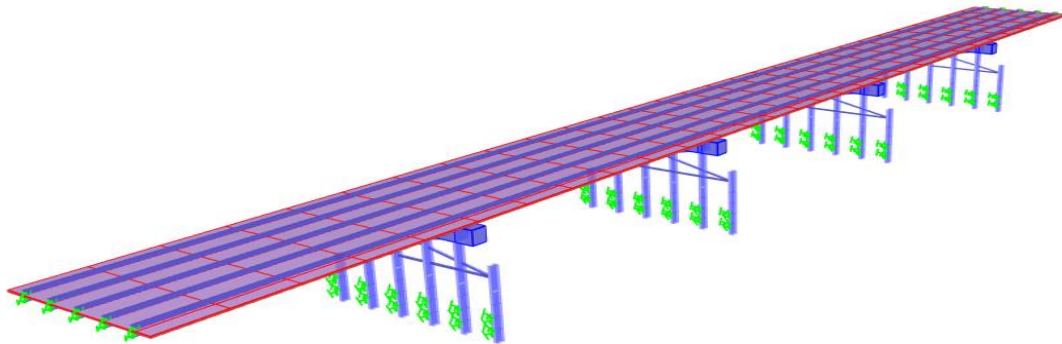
3D finite element view of MSC steel roadway bridge.
